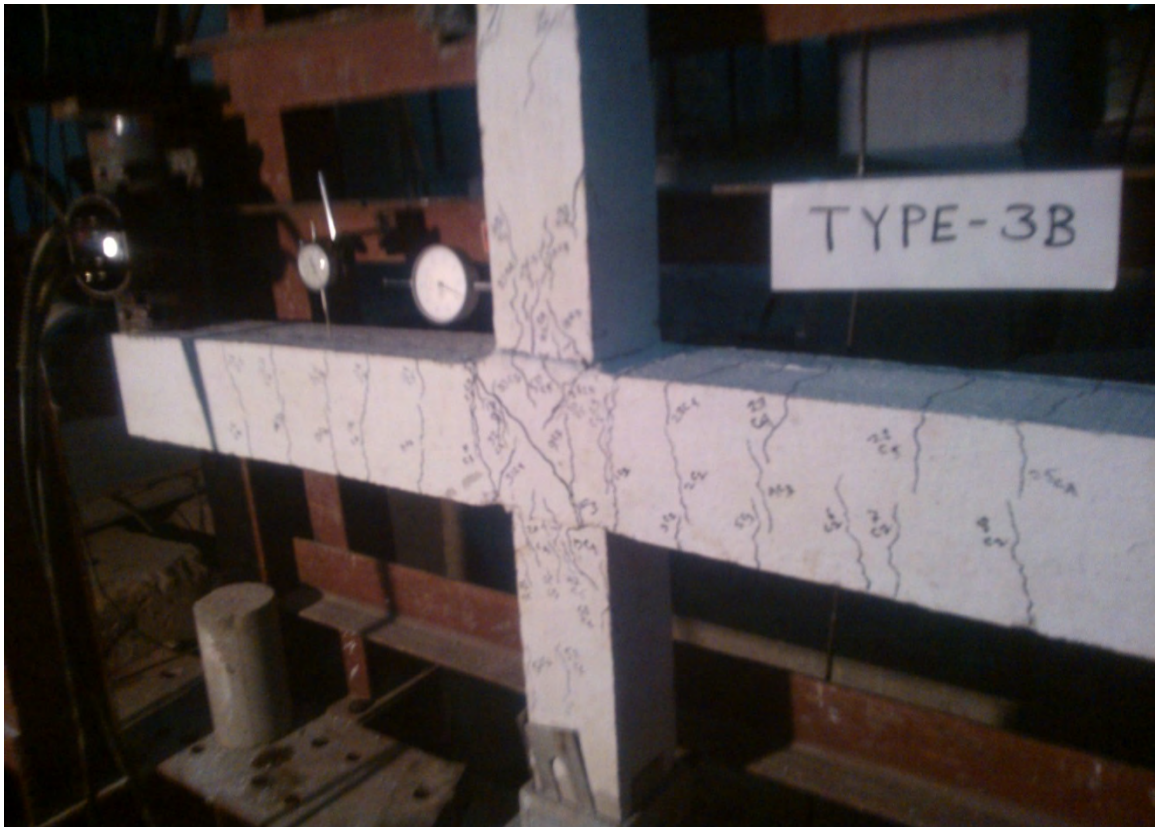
Final Crack Pattern of Type 3B Specimen
